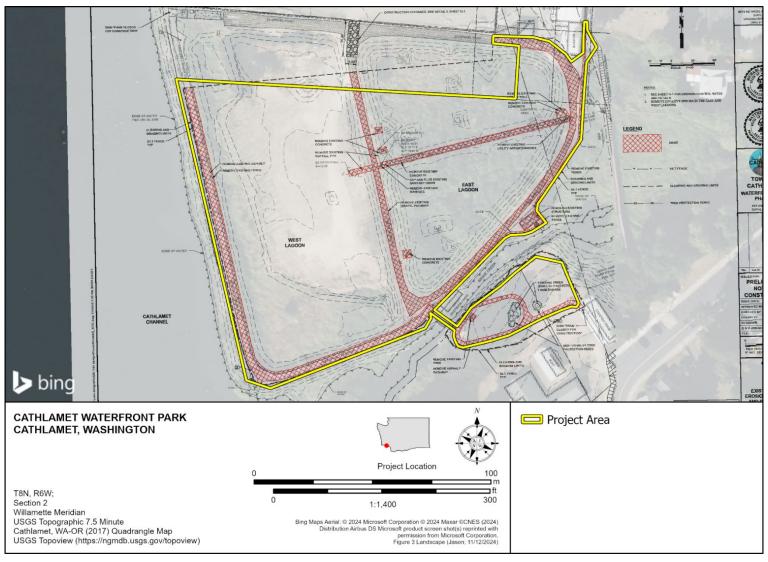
Construction plans for the Cathlamet Waterfront Park project showing structures and other features that will be removed. Additional offsite soils will be brought to the project area to fill and level the former lagoons.
